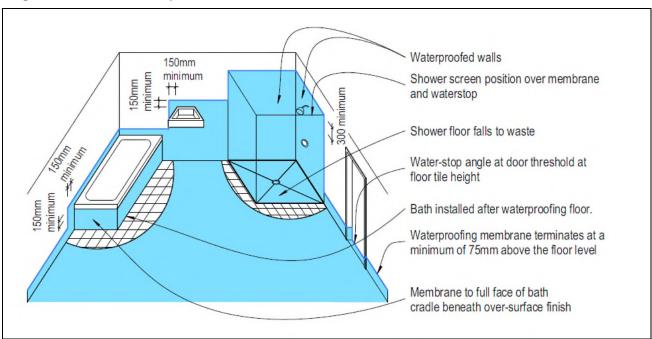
Typical extent of membrane in bathroom with hobless shower area
